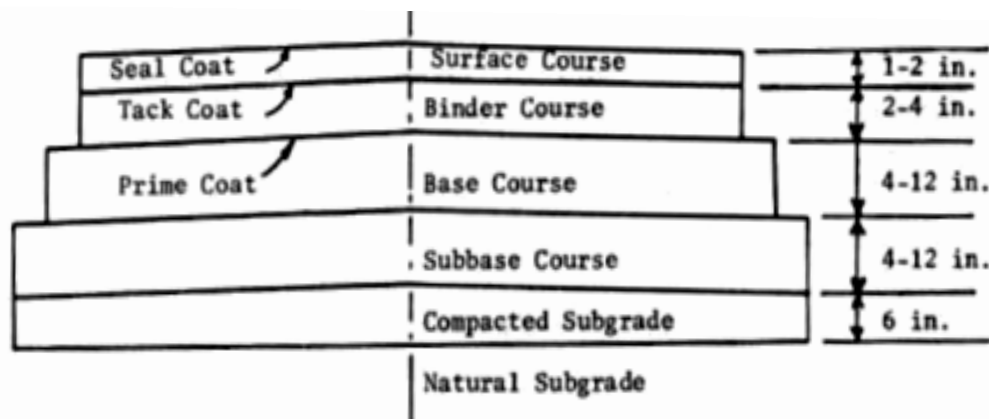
Typical pavement structure (Ordonez, 2006)
